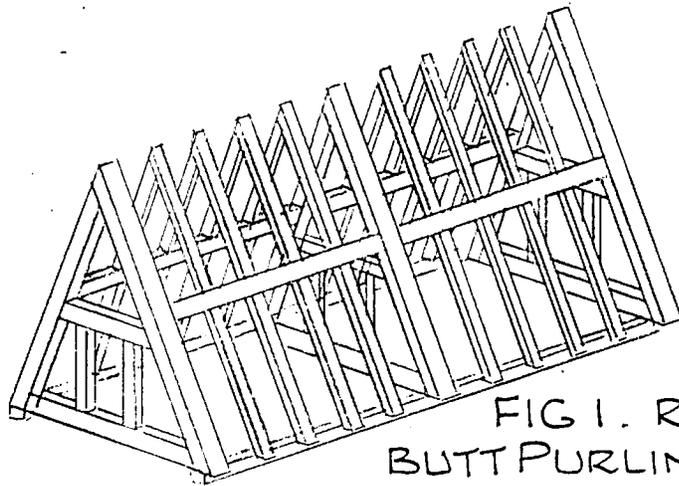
ROOF WITH BUTT PURLINS IN-LINE
